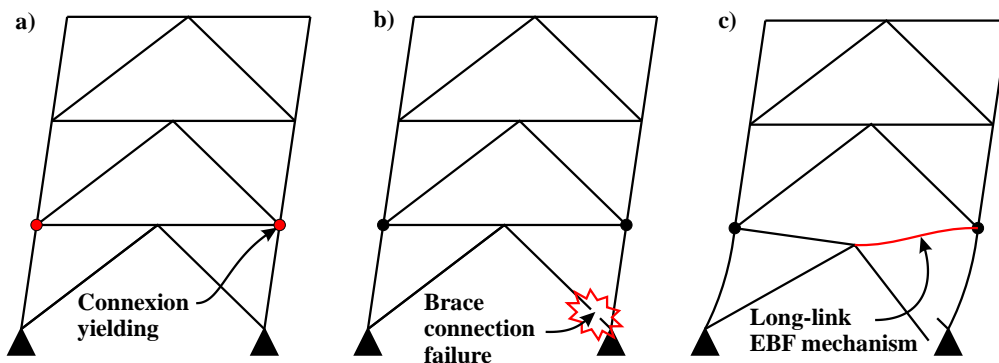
Braced frame deformation: a) at Point A; b) at Point B; and c) under lateral deformations developing after brace connection failure.
